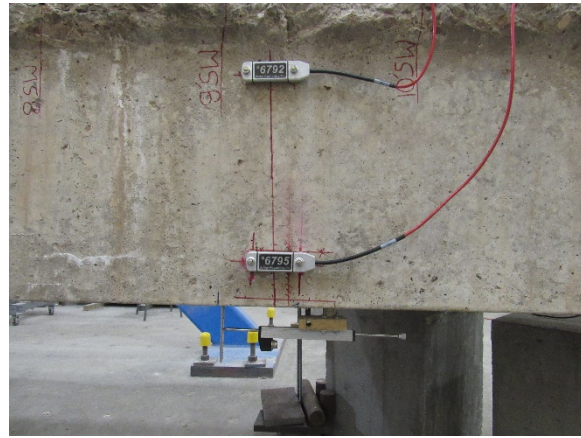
Strain Gauge Instrumentation Plan for 30-ft (9.14-m) Long Girder
